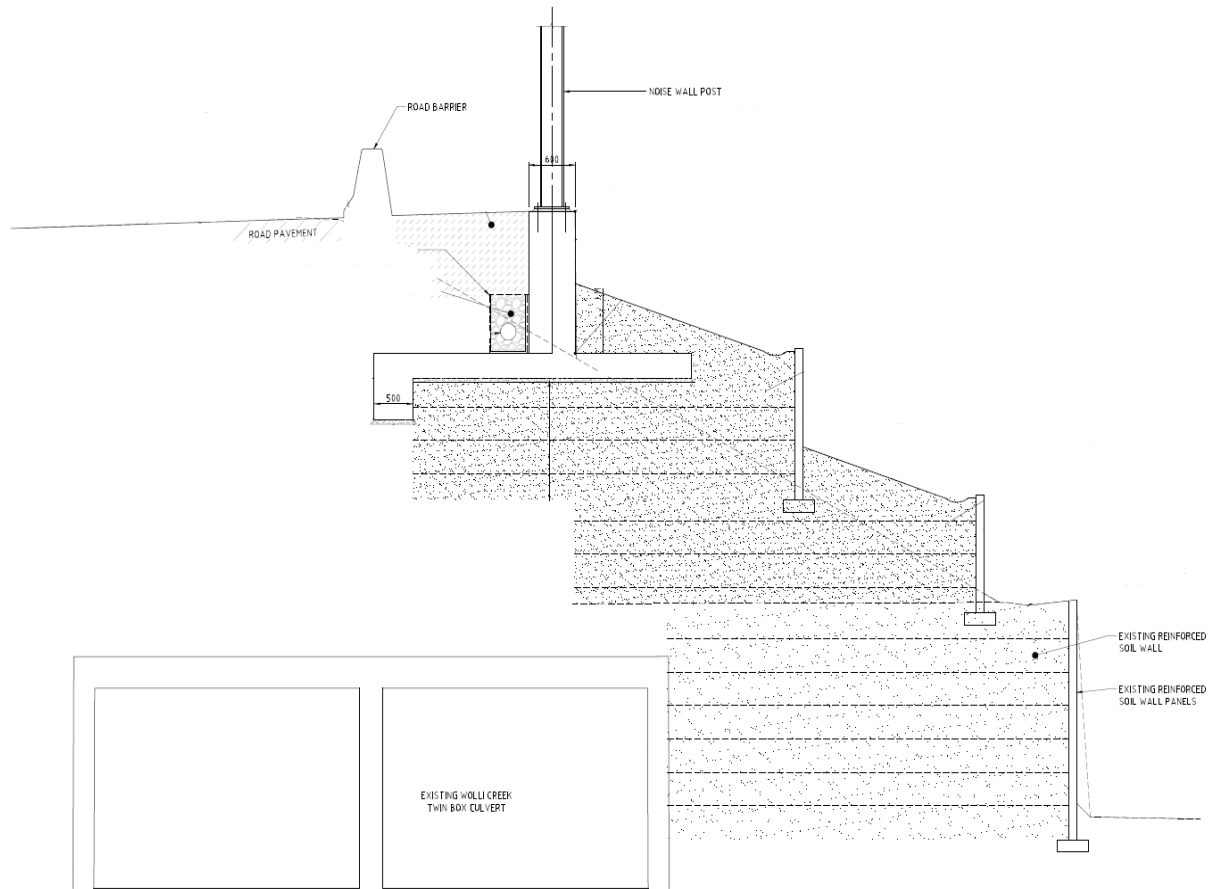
Noise Wall 4 (Figure 1 cross section – NW4 – XS4)
